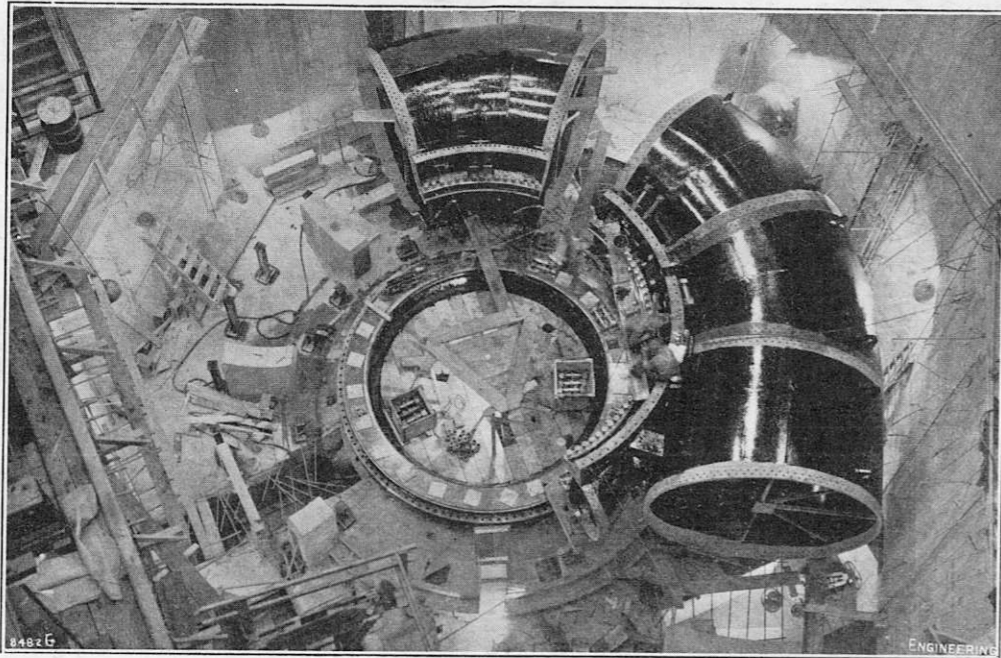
TURBINE SCROLL CASE BEING ASSEMBLED.
